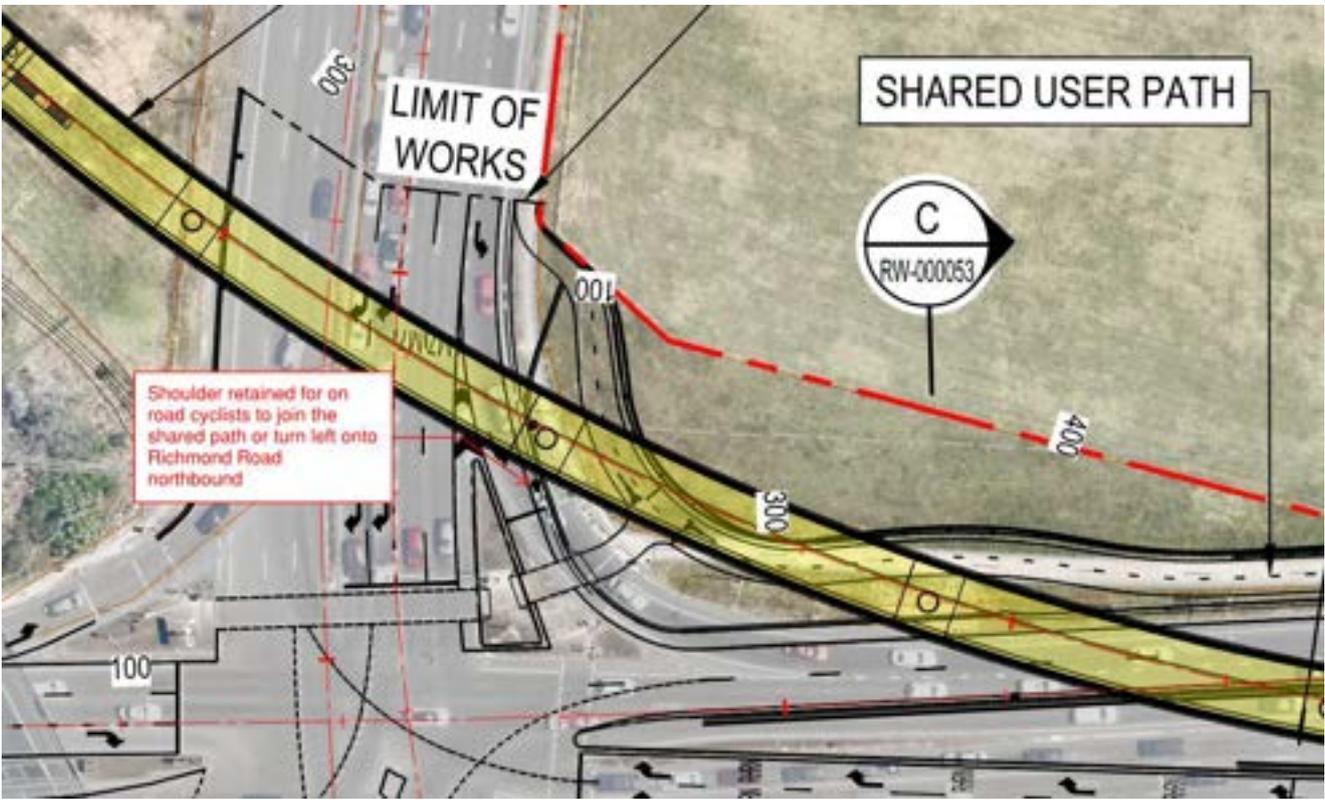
Cyclists on Rooty Hill Road North left turn lane shoulder
